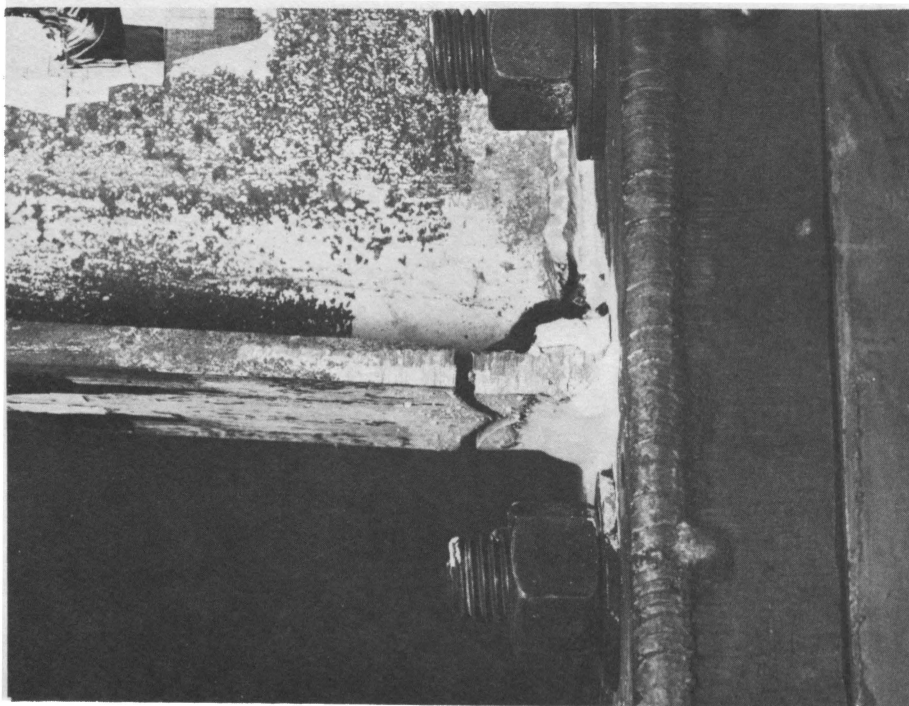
Cracking of the Tension Flange of Test H1
